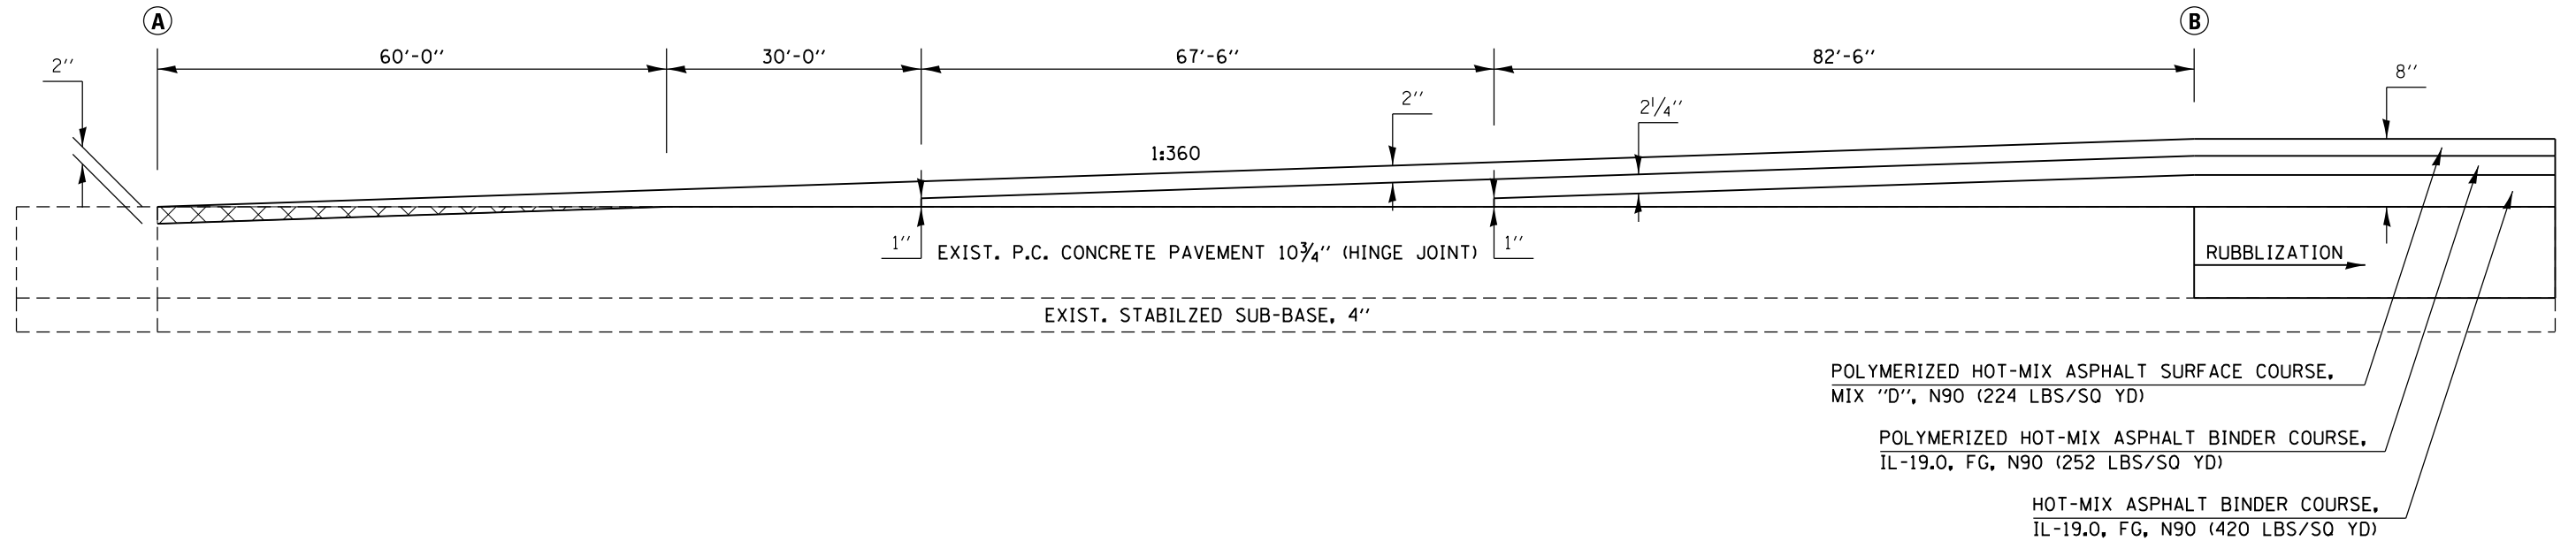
SHOULDER PATCHING AND PAVING TRANSITIONS UNDER S.N. 057-0212
